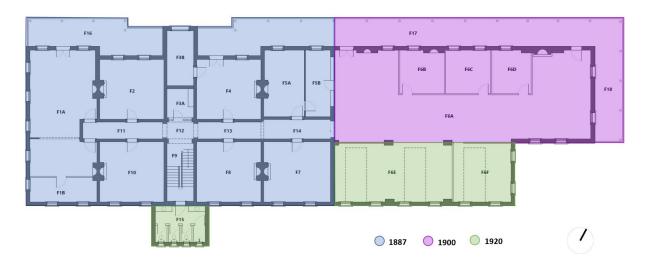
Phases of Construction: First Floor Plan. Source: Curio Projects, 2022.
